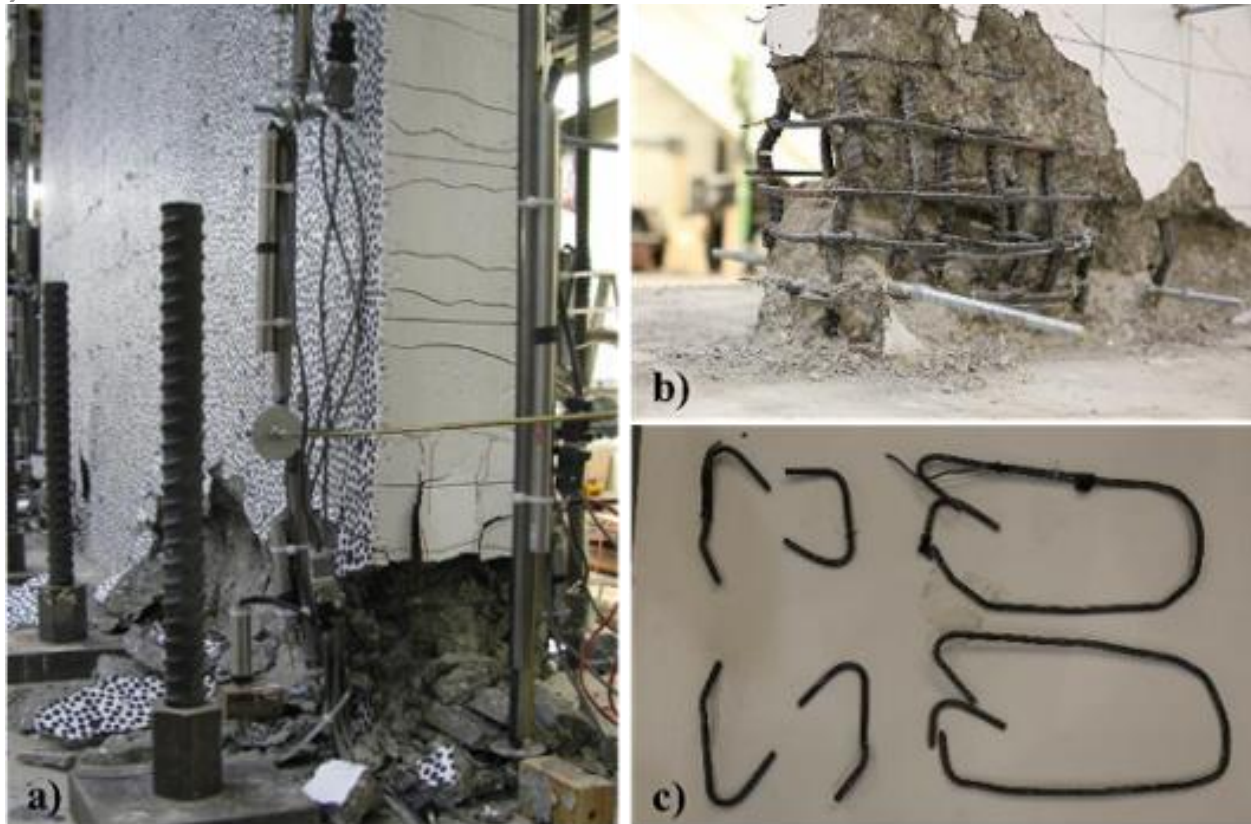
WP2: a) Damage at east edge; b) Buckled reinforcement; and c) Transverse reinforcement
